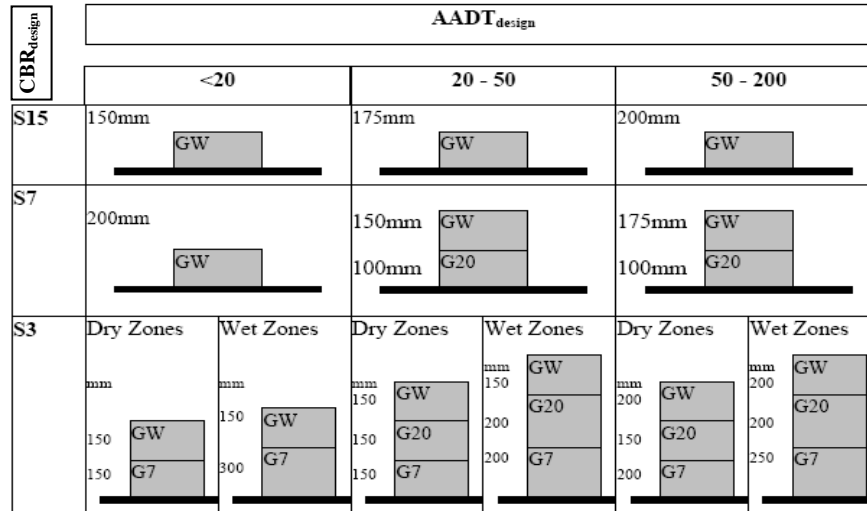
Pavement and Improved Subgrade for Gravel Roads for AADTs <200
